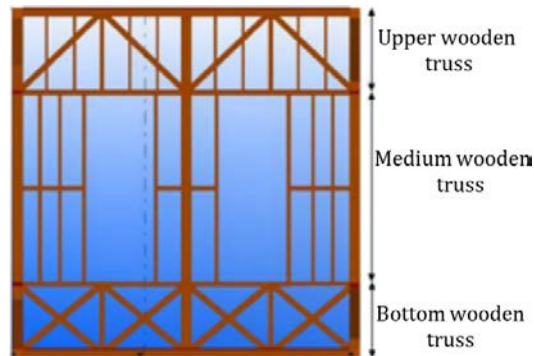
Çatki wall layout for one storey of the timber structure (Kaplan 2013).
